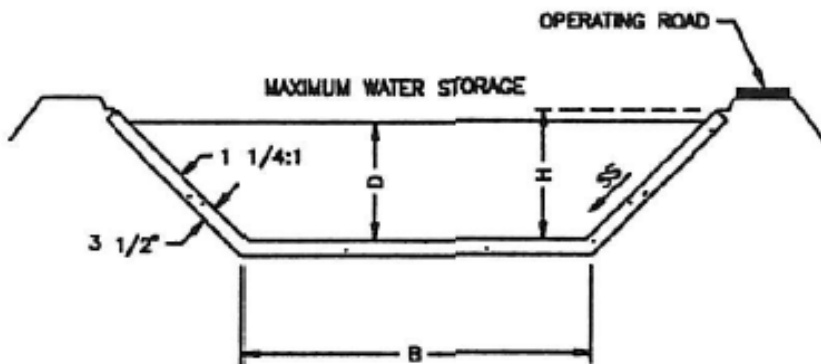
Typical Section, Concrete-lined Canal Segments
